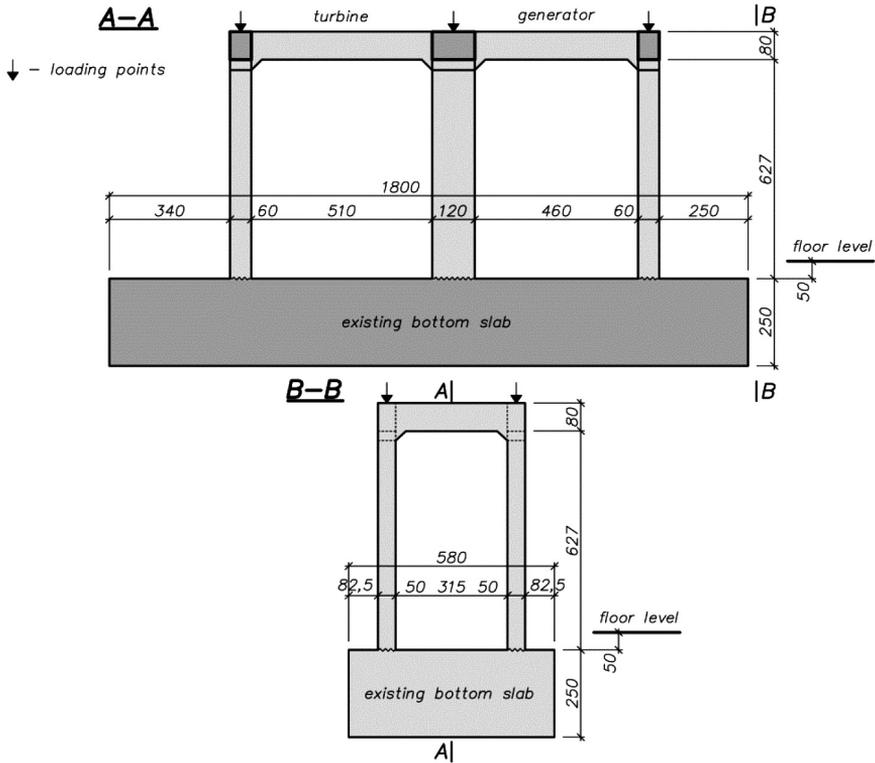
Longitudinal view and cross-section (dimensions in cm)
